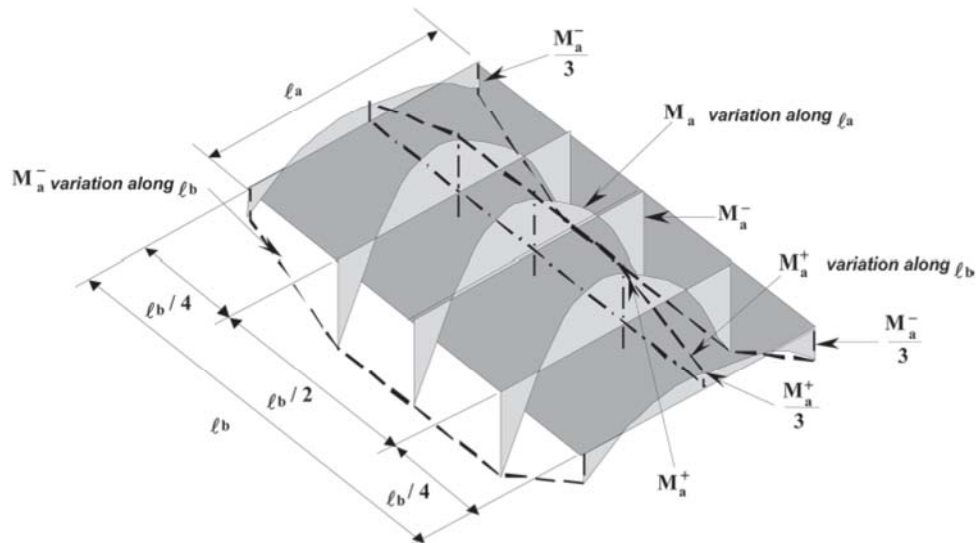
Variation of moment M_a across the width of critical sections for design, two-way slabs supported on girders, beams, or reinforced concrete walls.
